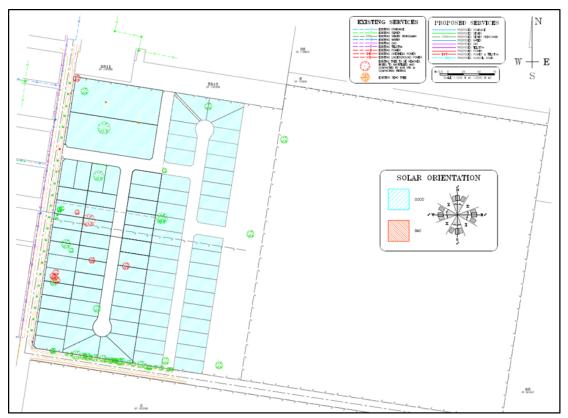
Solar orientation for the proposed layout by the Applicant.
